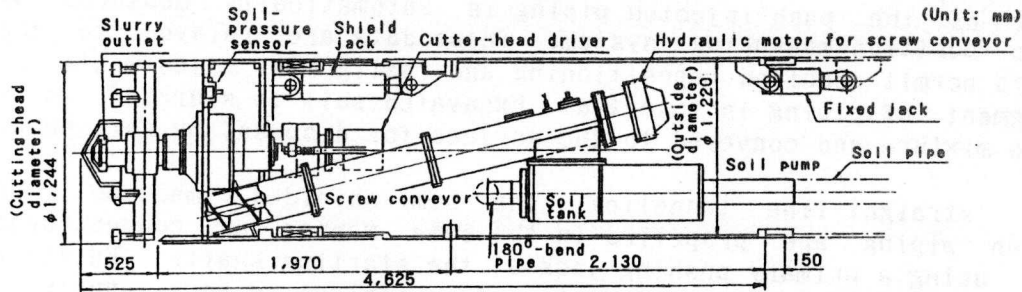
Structural Drawing of Self-Propelled, Semi-Shielded Machine
